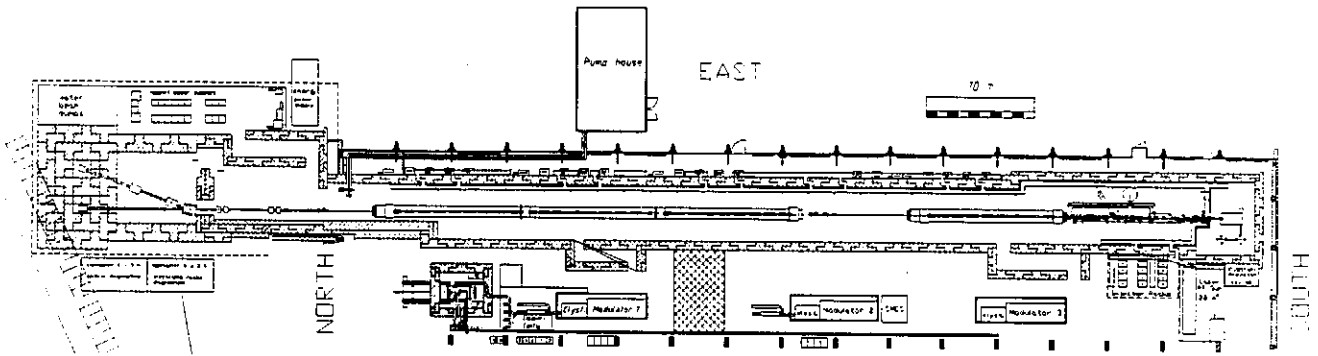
Plan View of the TESLA Test Facility Linac Layout.
